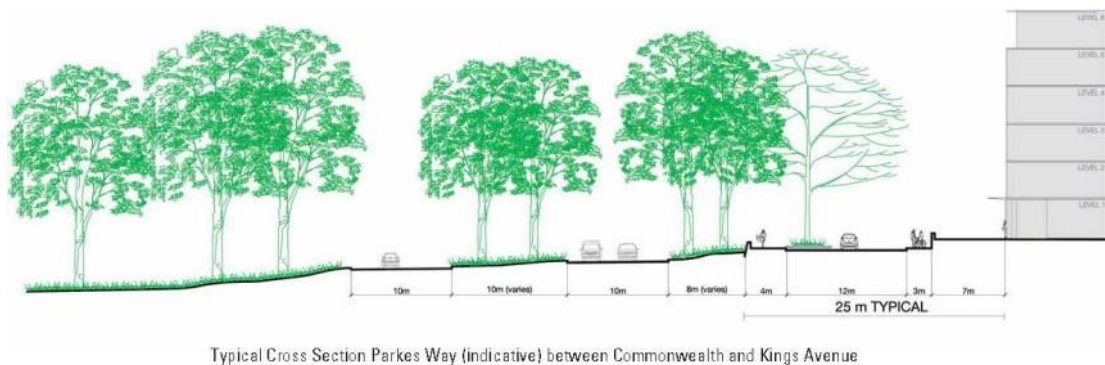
Constitution Avenue and Anzac Parade – Indicative typical cross section Parkes Way between Commonwealth and Kings Avenue
